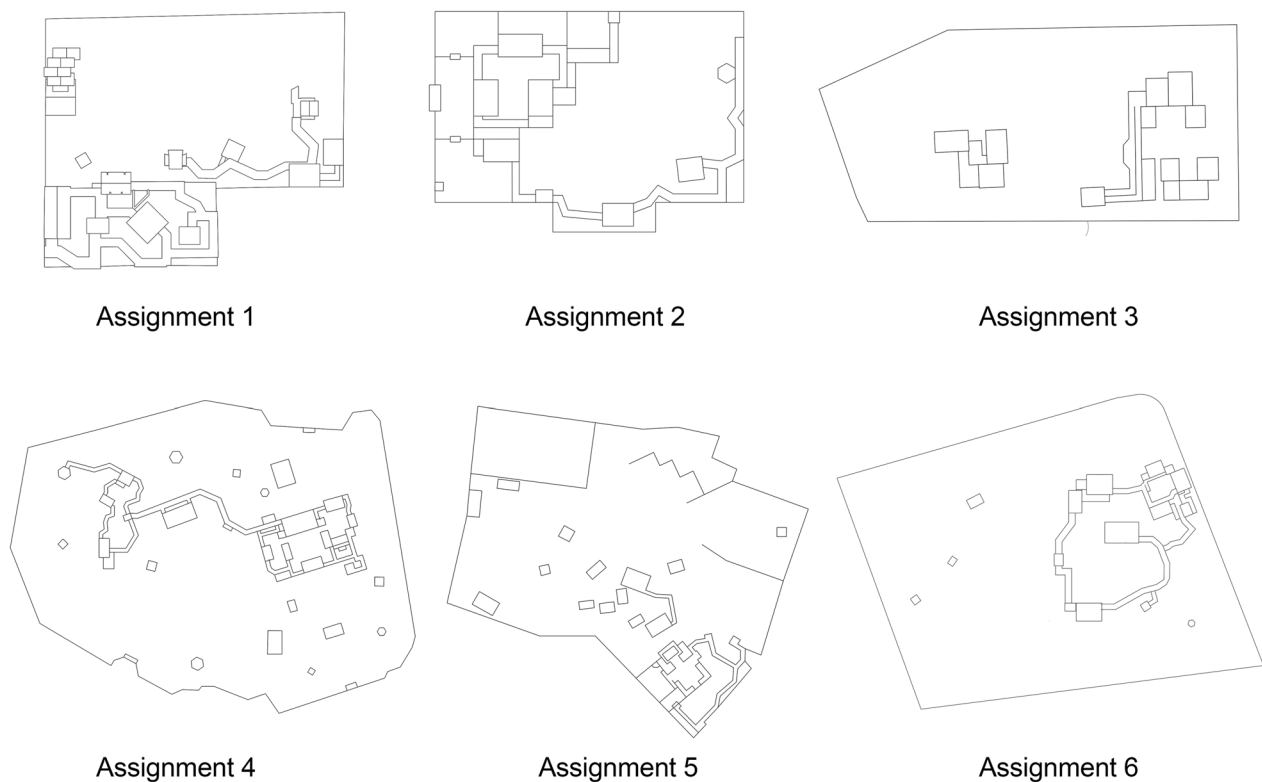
Six garden floor plans selected from the “Jiangnan Garden Design” course, Assignment 1–6
